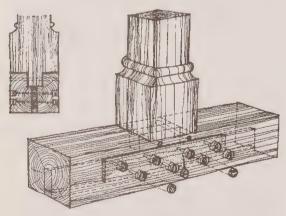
Strengthening a joint in a fish plate set into a beam across a crack which has formed beneath the mortise.
